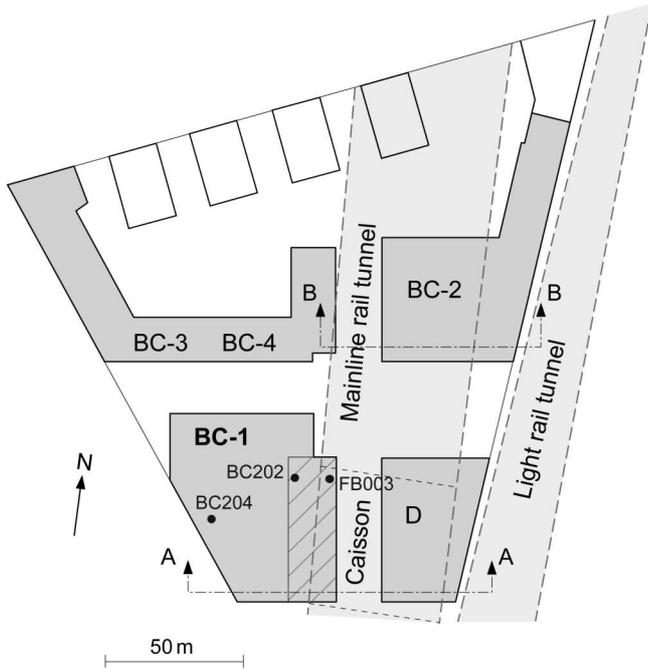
Beisheim Center: plan view with location of observation points. The hatched area indicates the high-rise section of building BC-2
